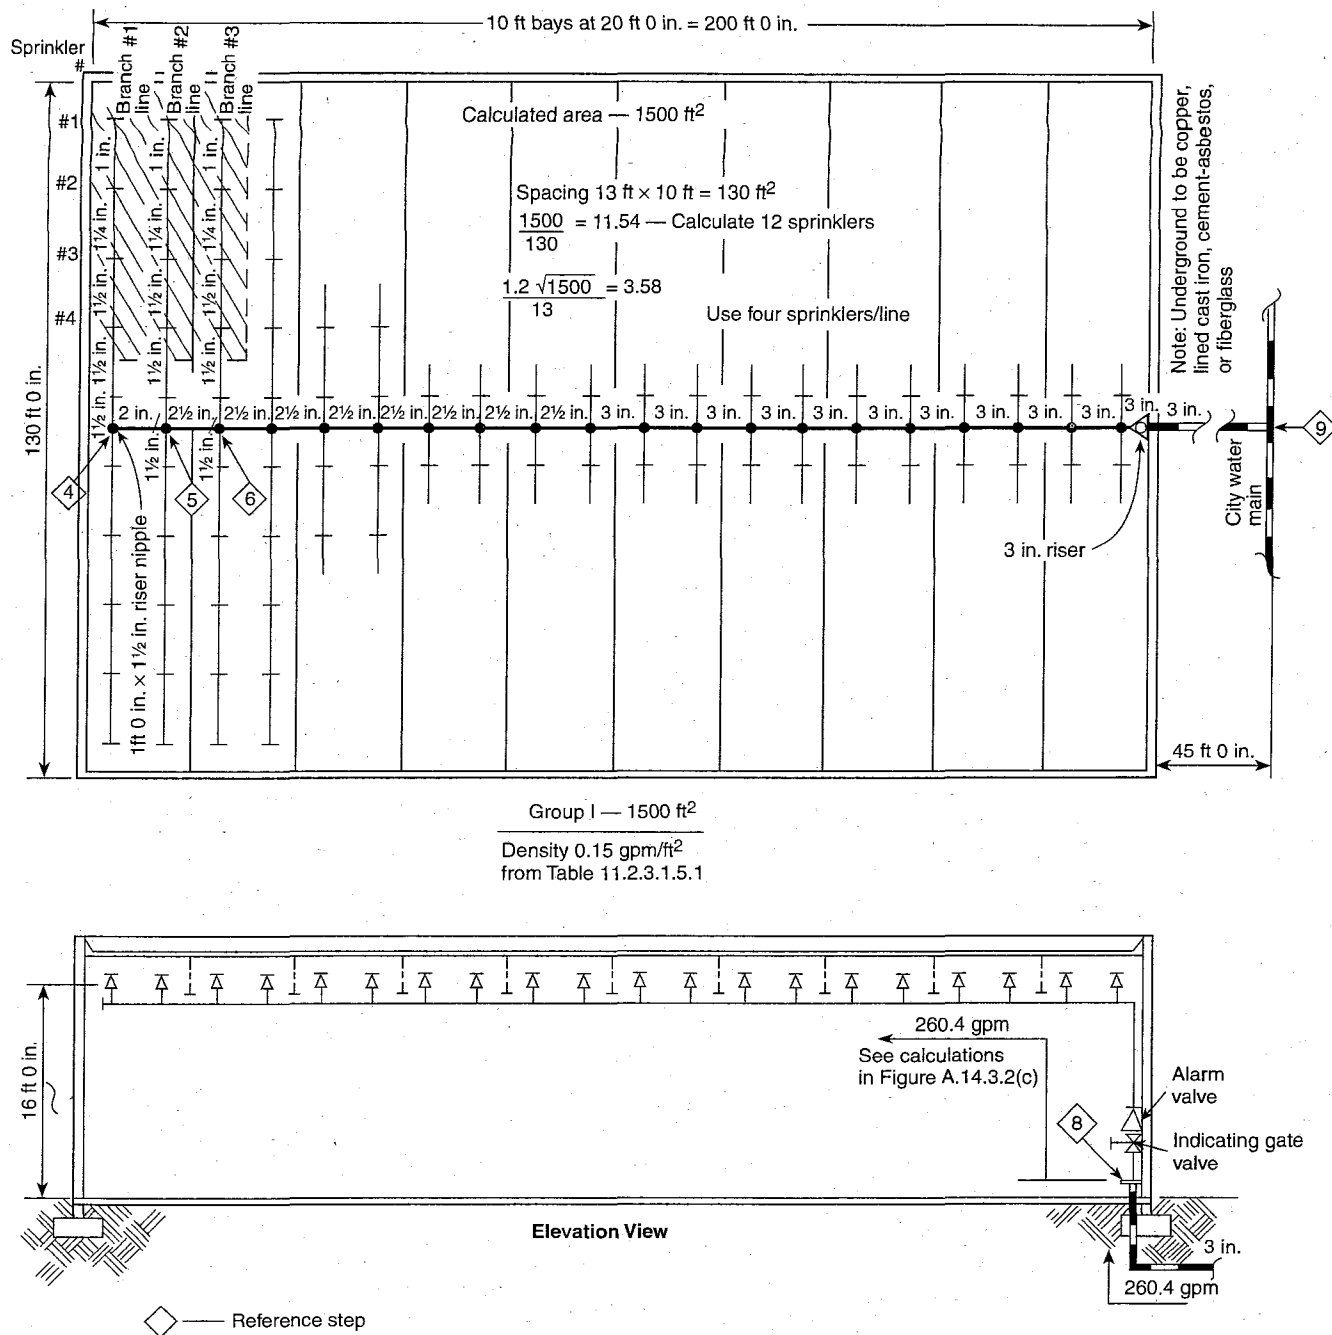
(b) Hydraulic Calculation Example (Plan View and Elevation View).
